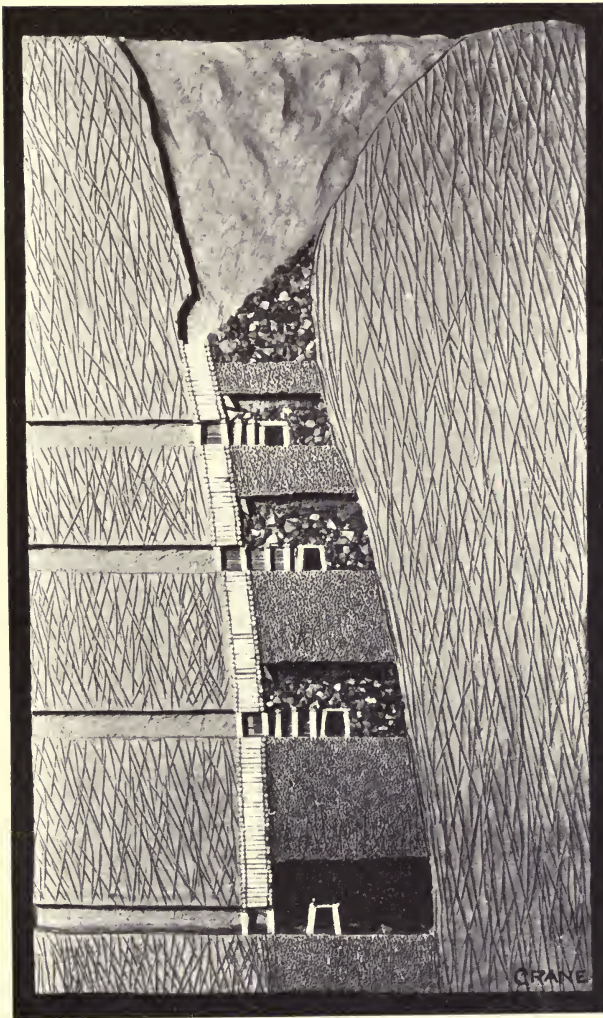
Vertical Section through Lode Showing Application of Back-Filling Method. Chute in the foot-wall may or may not be timbered, but should be timbered when manways are combined with ore chutes.
